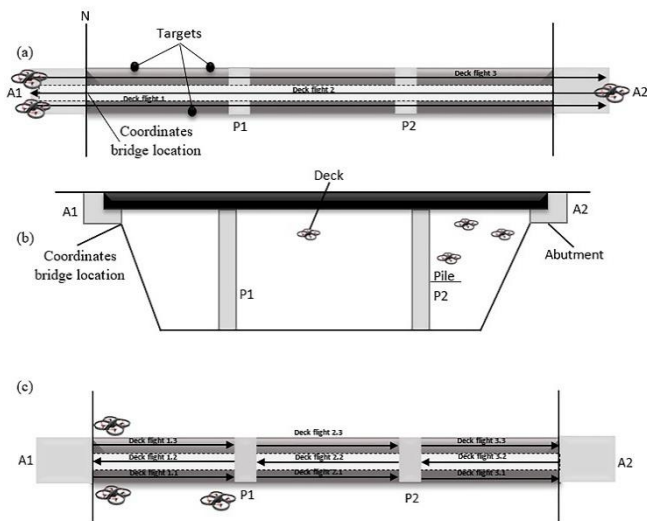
(a) Acquisition of image; (b) Abutments (A1 and A2) and piers (P1 and P2); and (c) deck and bridge location
